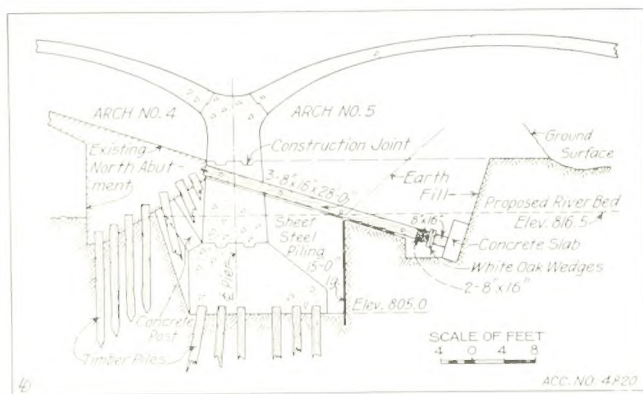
SKETCH SHOWING CONSTRUCTION OF NEW PIER BEHIND THE OLD ABUTMENT OF THE ADAMS STREET BRIDGE.
